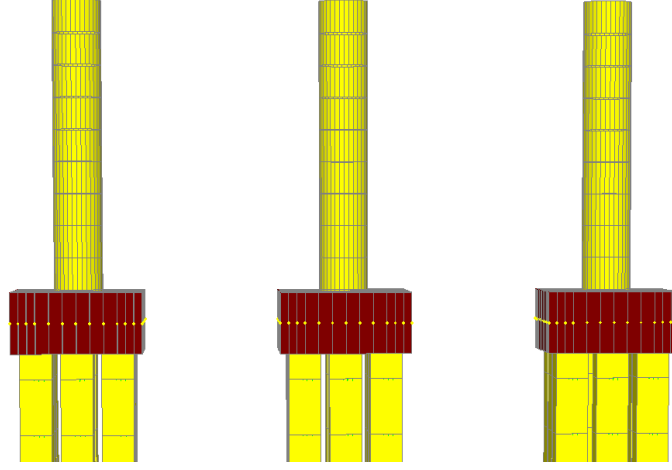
Scheme of columns and pile foundation modeling in SAP2000
